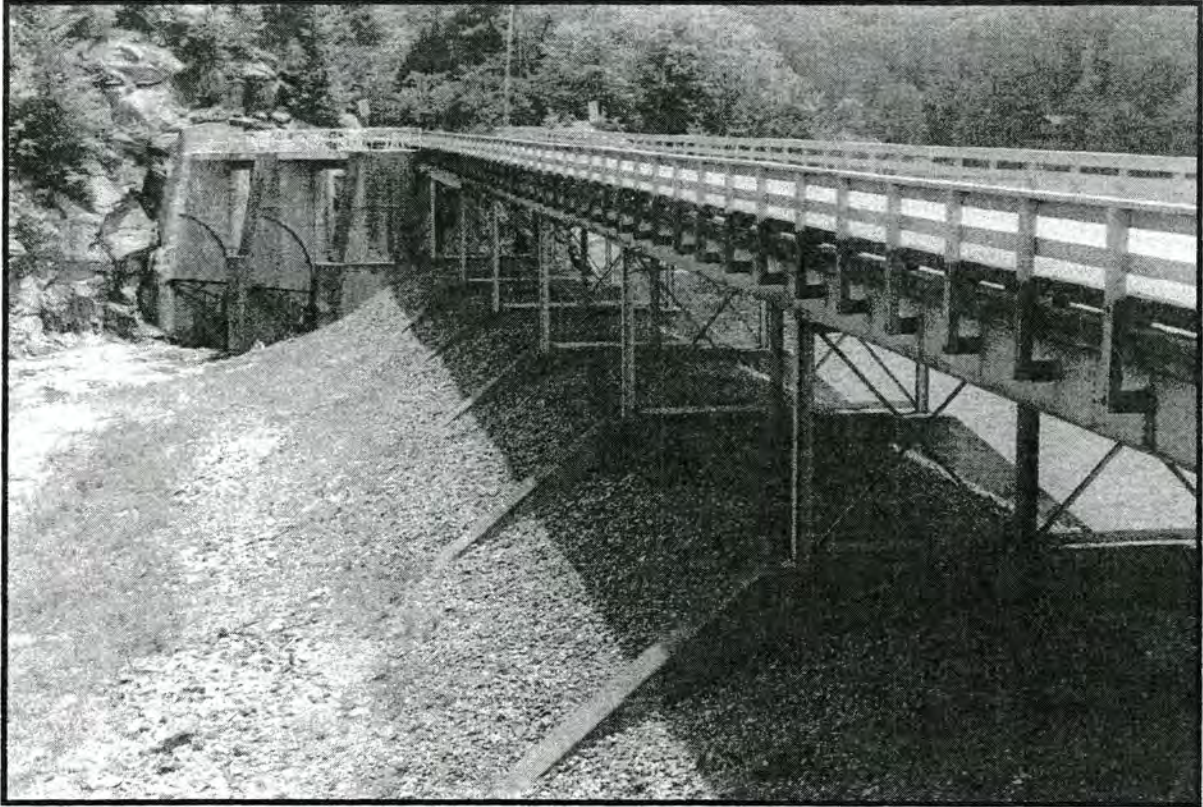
The Thorpe Dam showing paved State Route 1157, and the concrete spillway.
